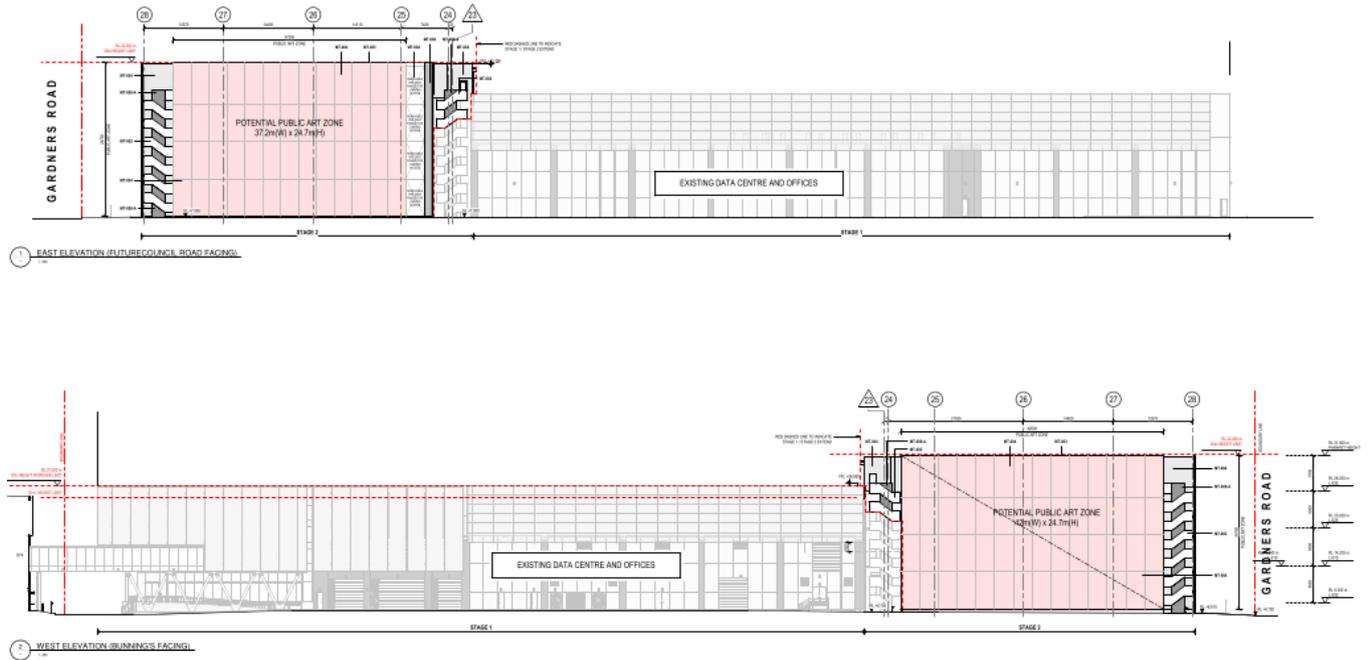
Existing / proposed east elevation and west elevations, including future public art zones
